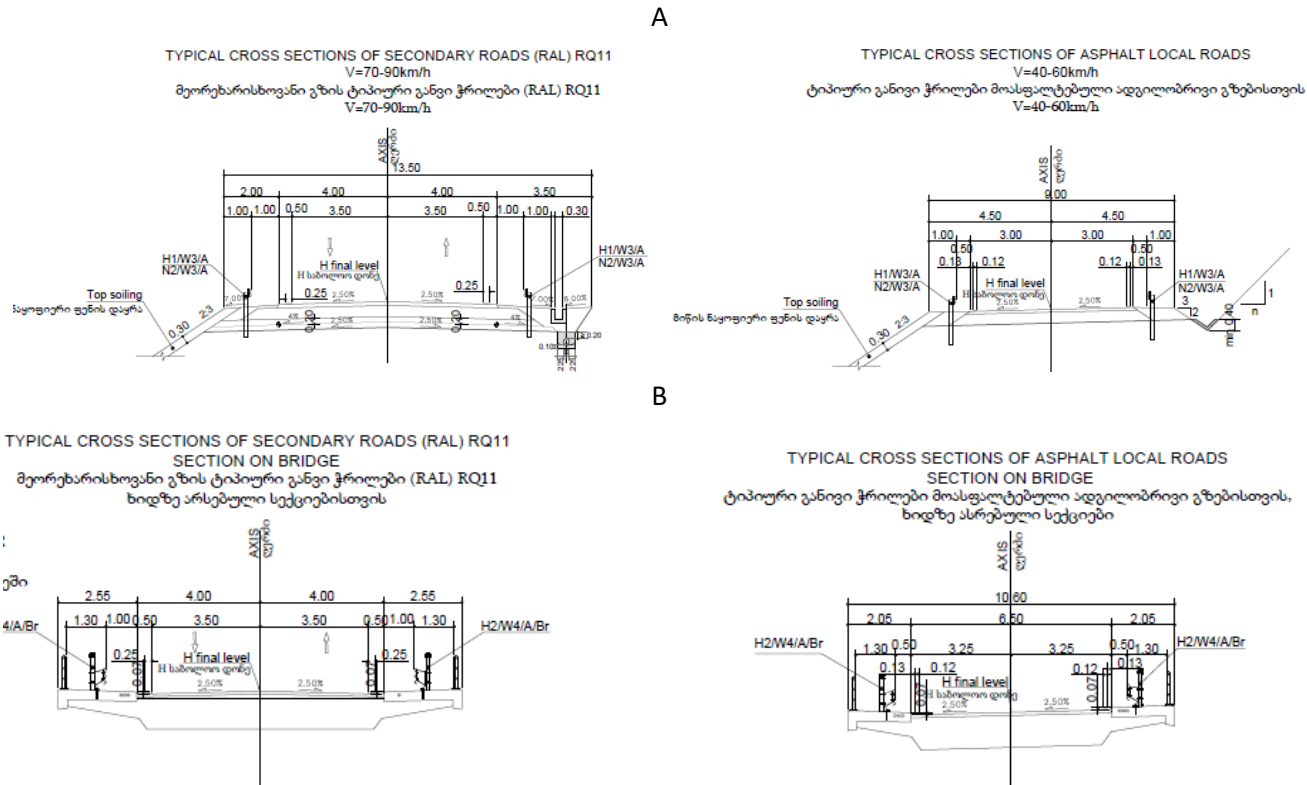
Typical cross-sections for Secondary and Local roads
